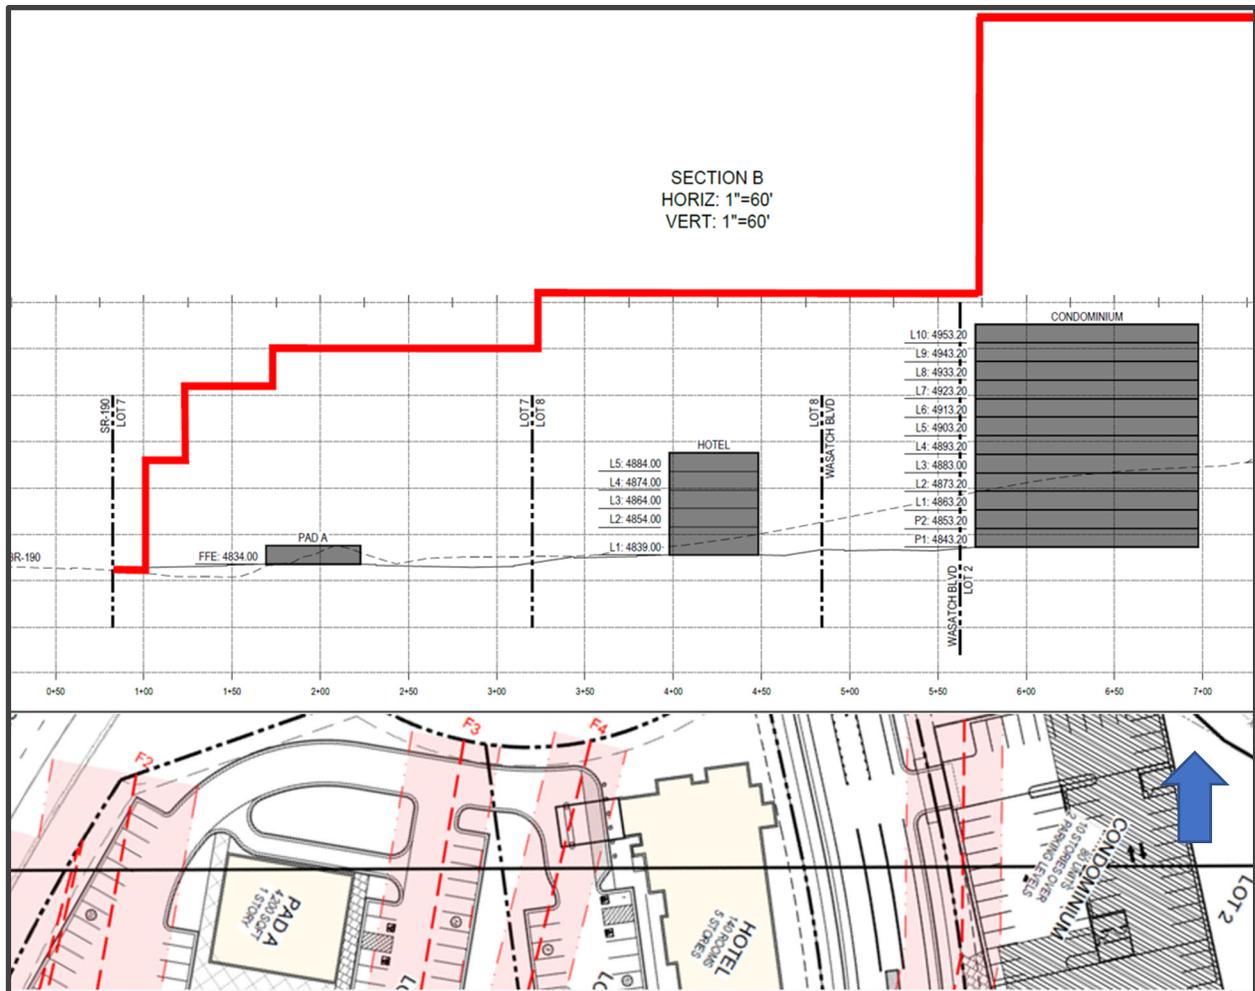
NORTH BUILDINGS - HEIGHT CROSS SECTION (RED MAXIMUM HEIGHT PERMITTED)
